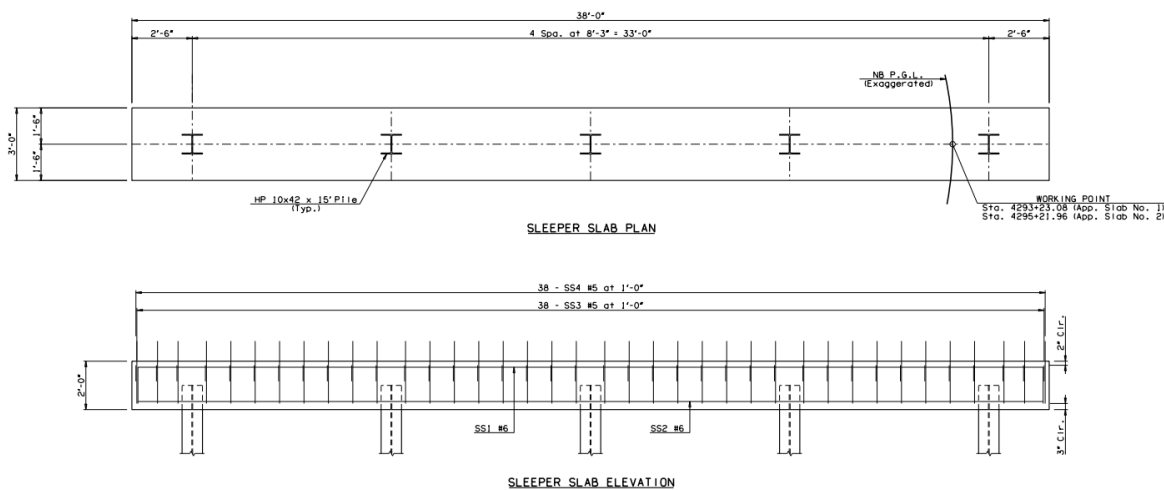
An example of the grade beam plan and elevation, along with the bearing piles.
